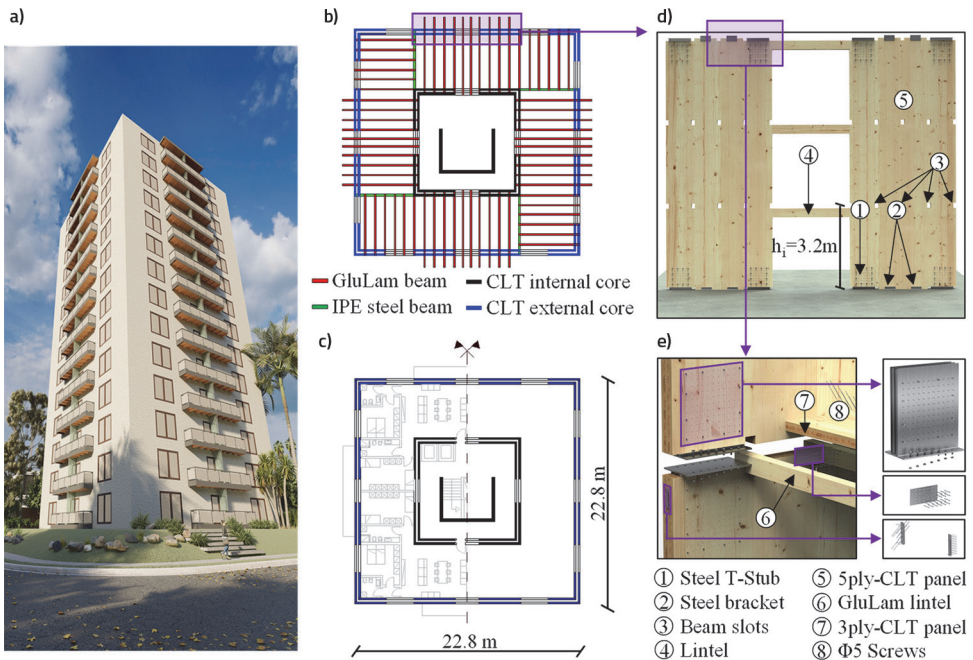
a) Axonometric view; b) Structural; c) architectural plan; d) Shear wall; e) Connection detail
